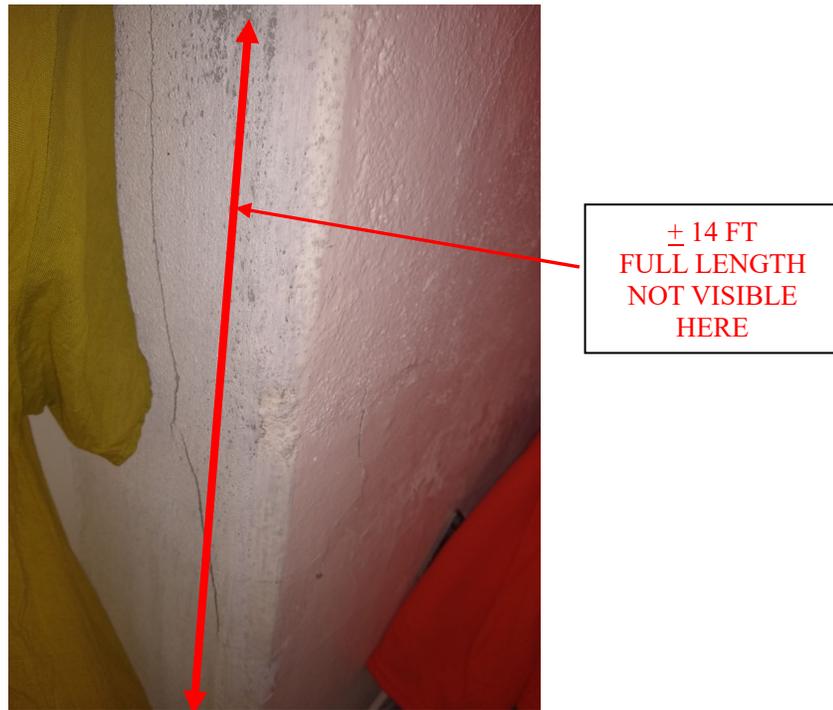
Location 31. Approximately 14 ft long new 16x12 concrete column. See detail 6/S104.
